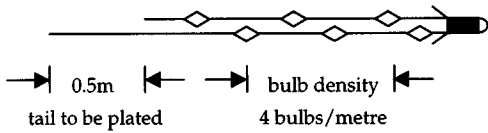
A typical two-strand cable used for back reinforcement in Australia.
